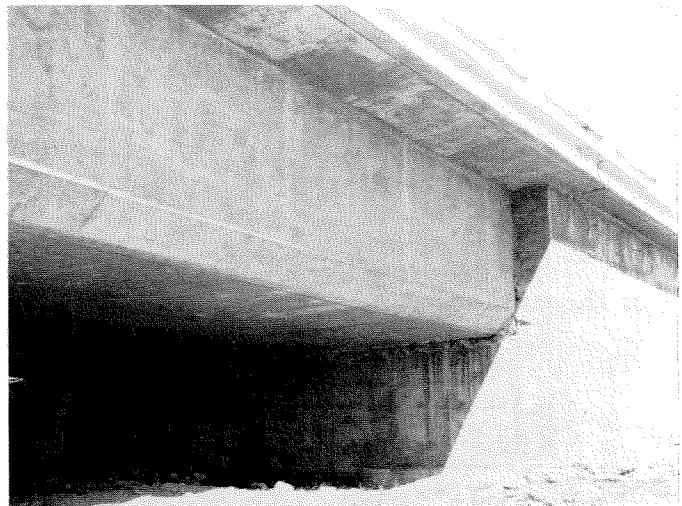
Abutment of the remaining eastern section of the collapsed overcrossing, Golden State-Antelope Valley freeway interchange.
